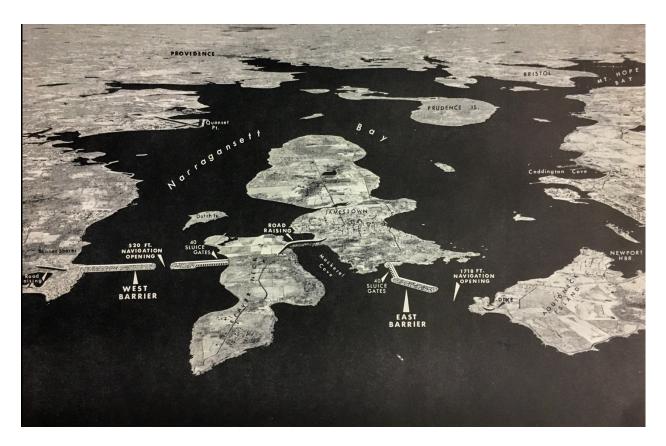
Revised plans for the Narragansett Bay barriers, April 1964. Source: New England Division of the U.S. Army Corps of Engineers (Waltham, Massachusetts).
